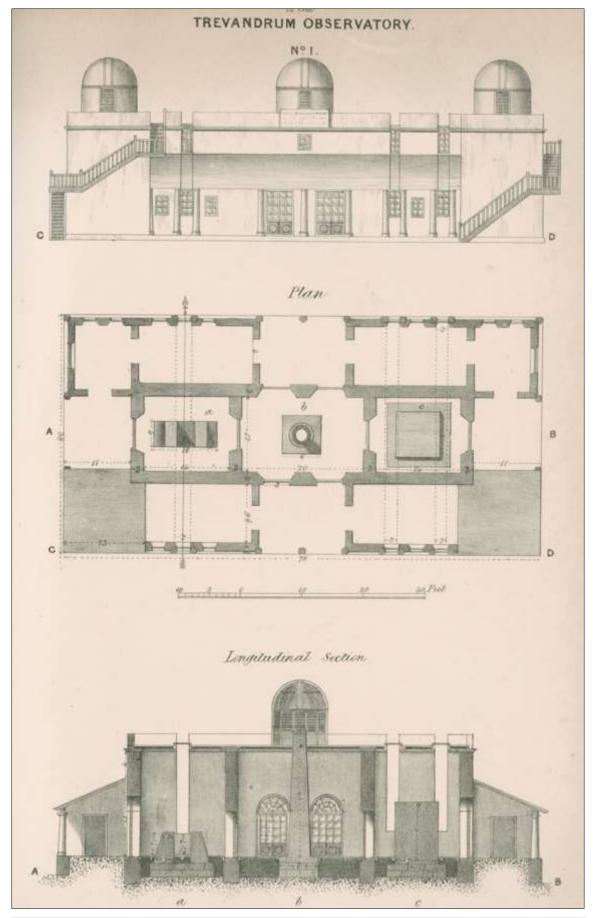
The elevation, plan and longitudinal section of Trivandrum Observatory, 1837 (en.wikipedia.org).8
